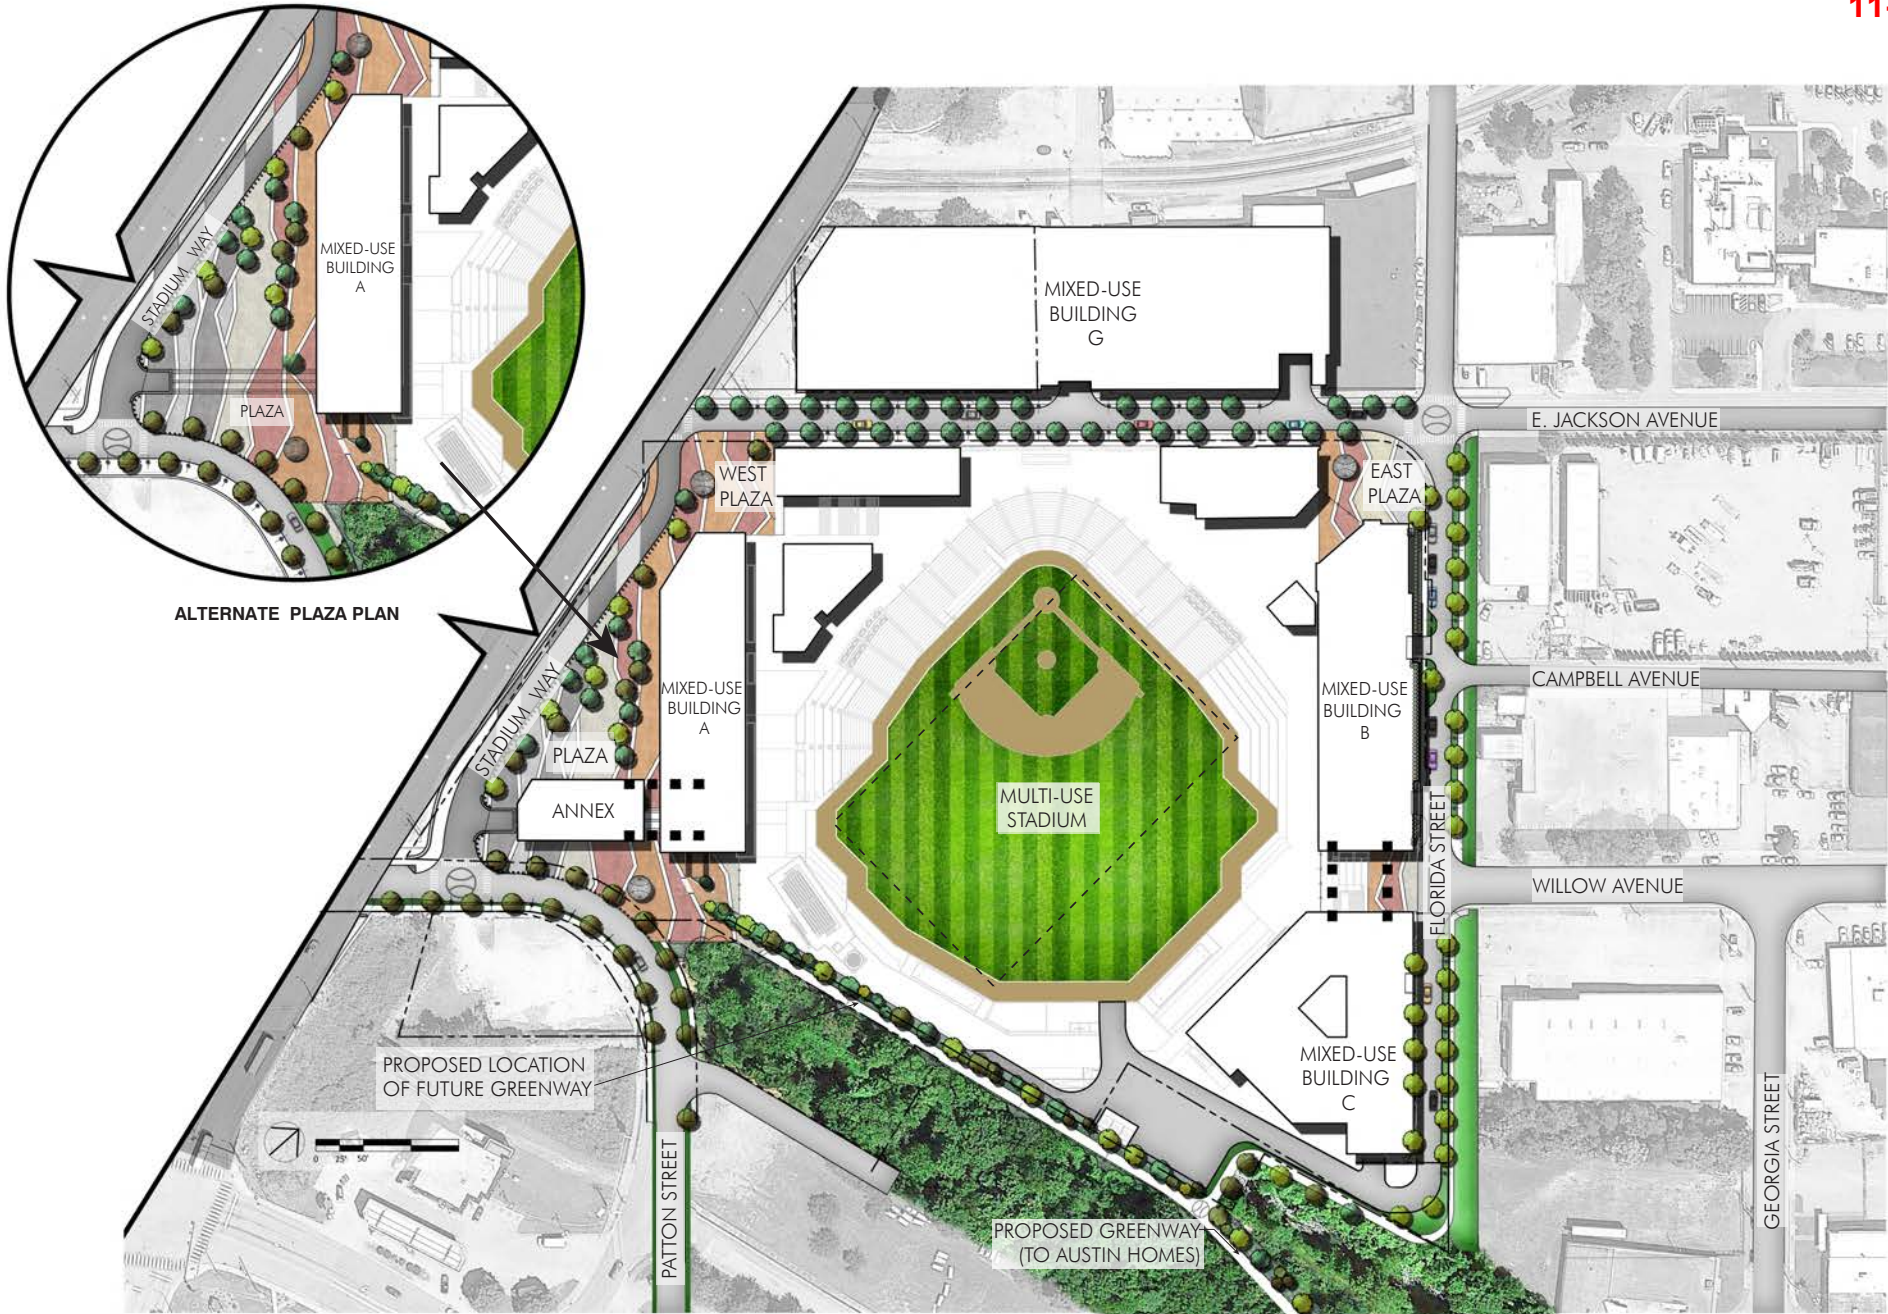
SITE LANDSCAPING INTENT CONCEPT PLAN
